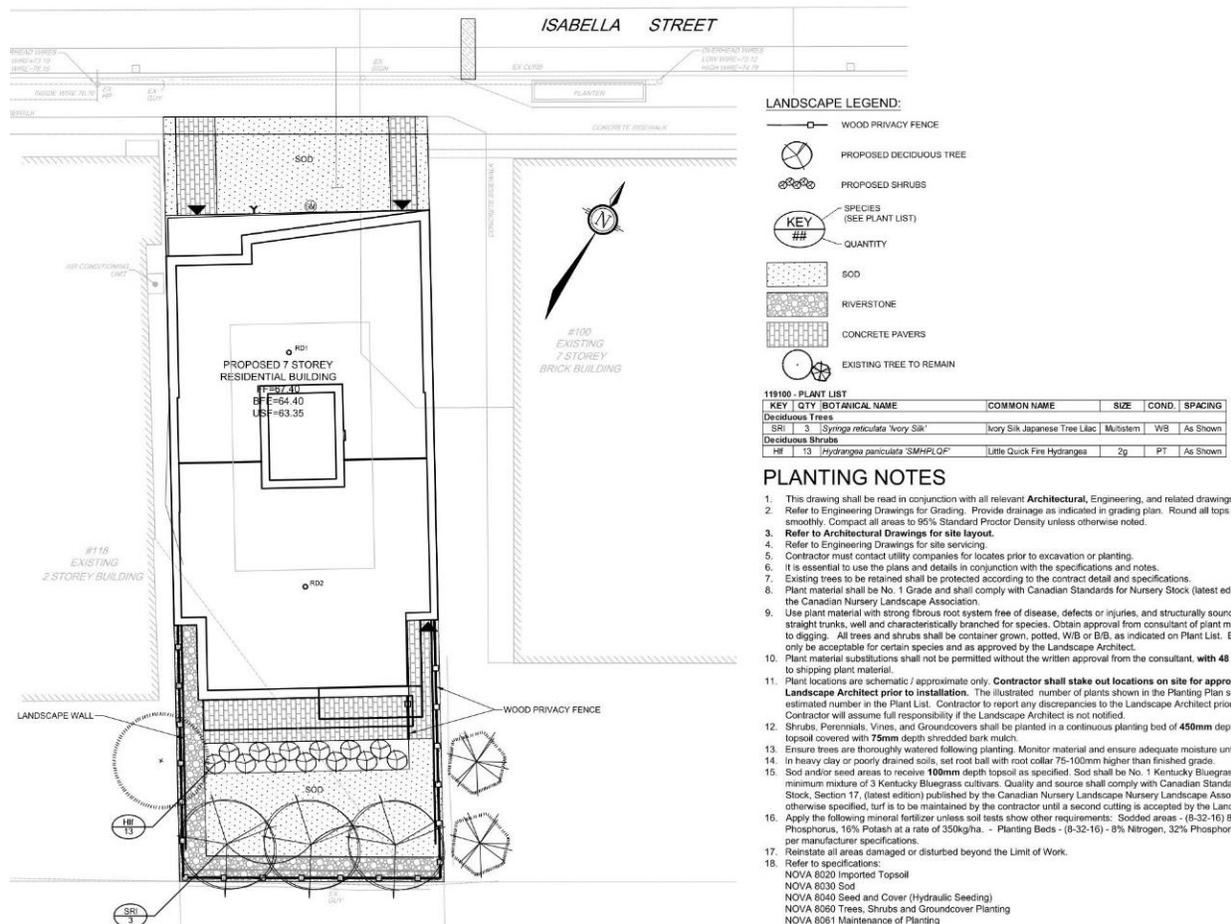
Landscape Plan, Excerpt (Novatech, revision April 09, 2020)
